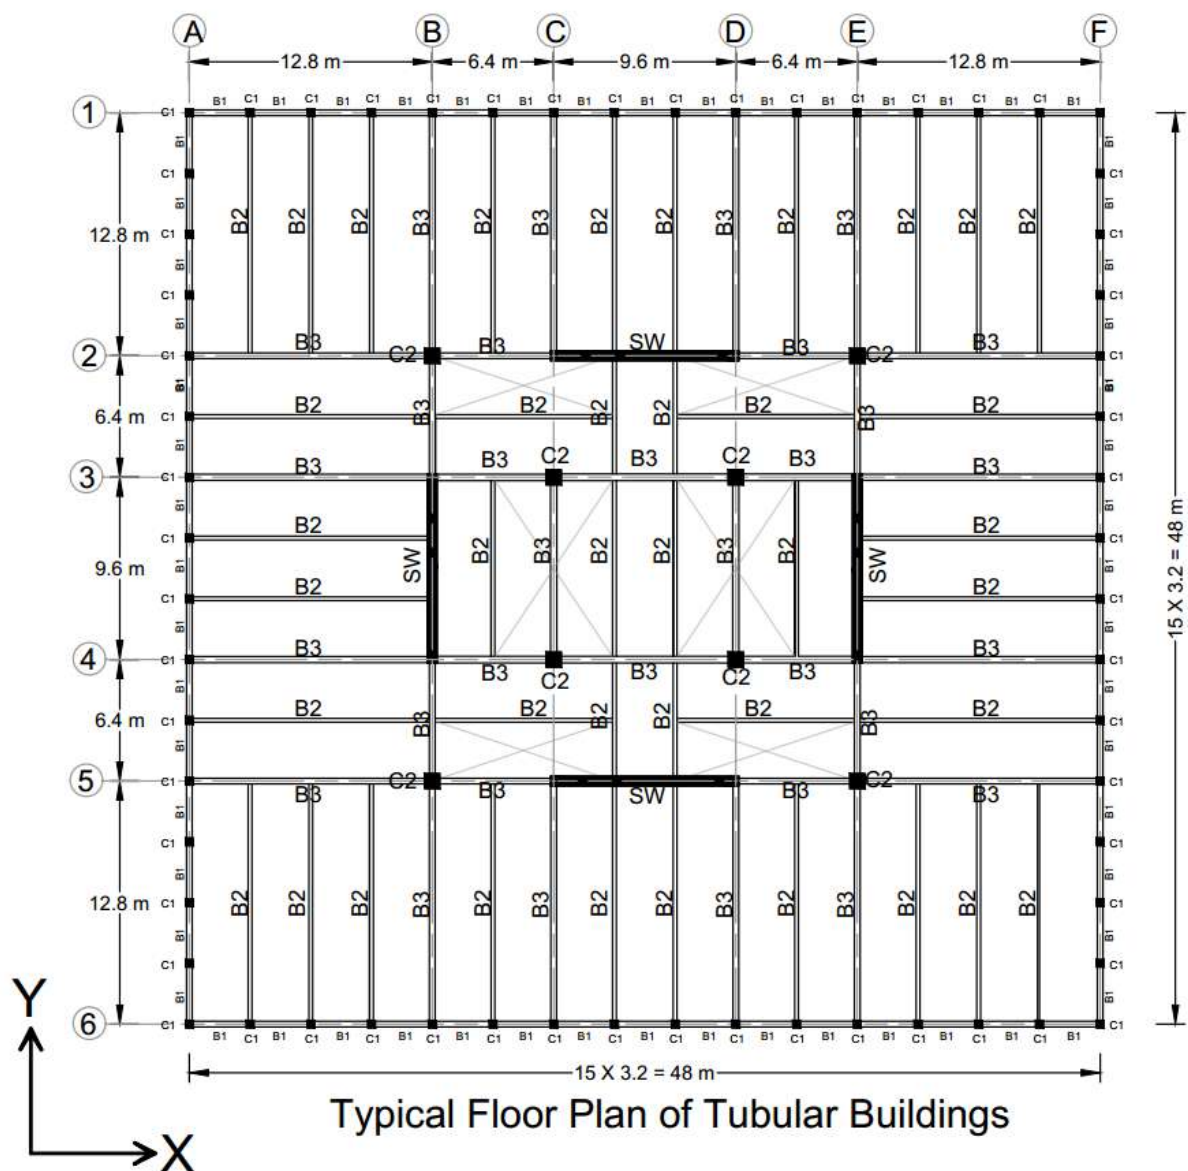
Typical Floor Plan of TB Tall Buildings
